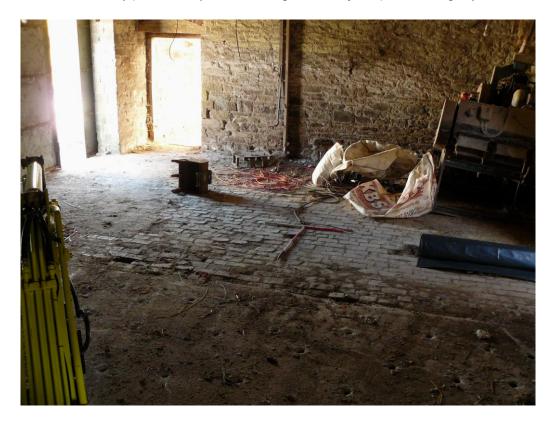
Internal view looking SE showing brick cobbled floor in stable at SE end of threshing barn (Building 1)
